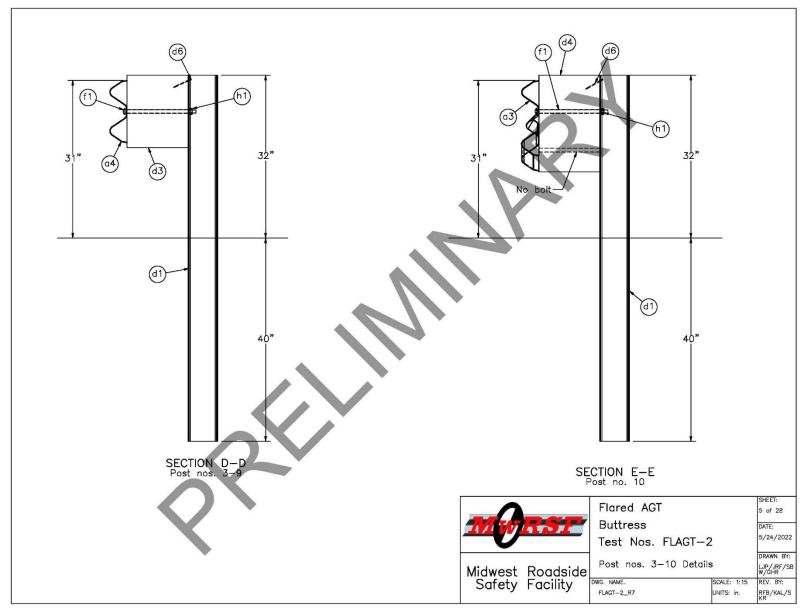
Post Nos. 3 through 10 Details, Test No. FLAGT-2
